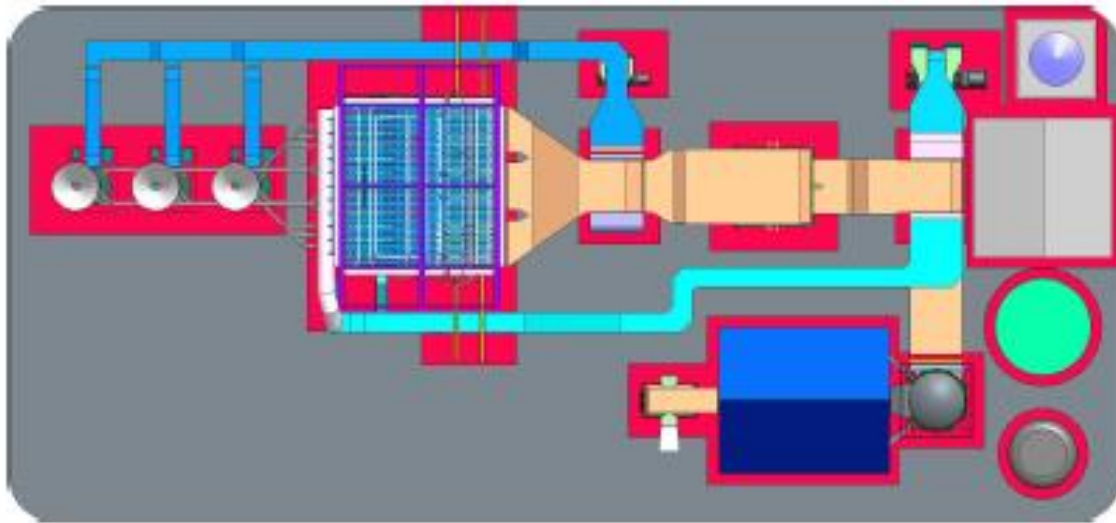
Conceptual Layout of RPI's Air Fired Heater and AQCS Equipment – Top-Down View for layout
